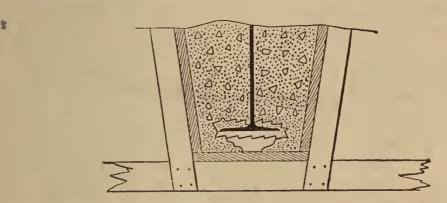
Cavity Caused by Poor Ramming or Puddling.
